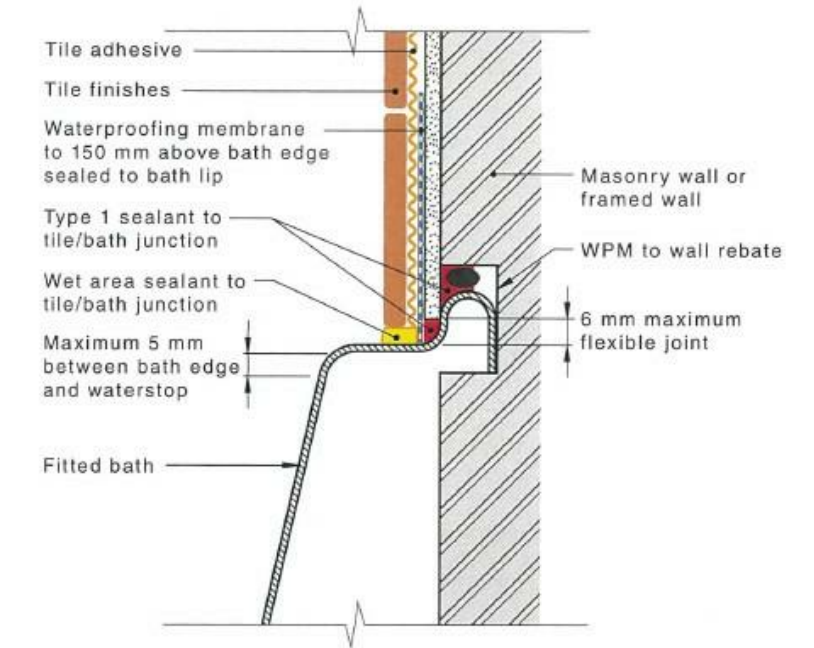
(A) — Shower over bath — Fitted bath — Framed or masonry walls
